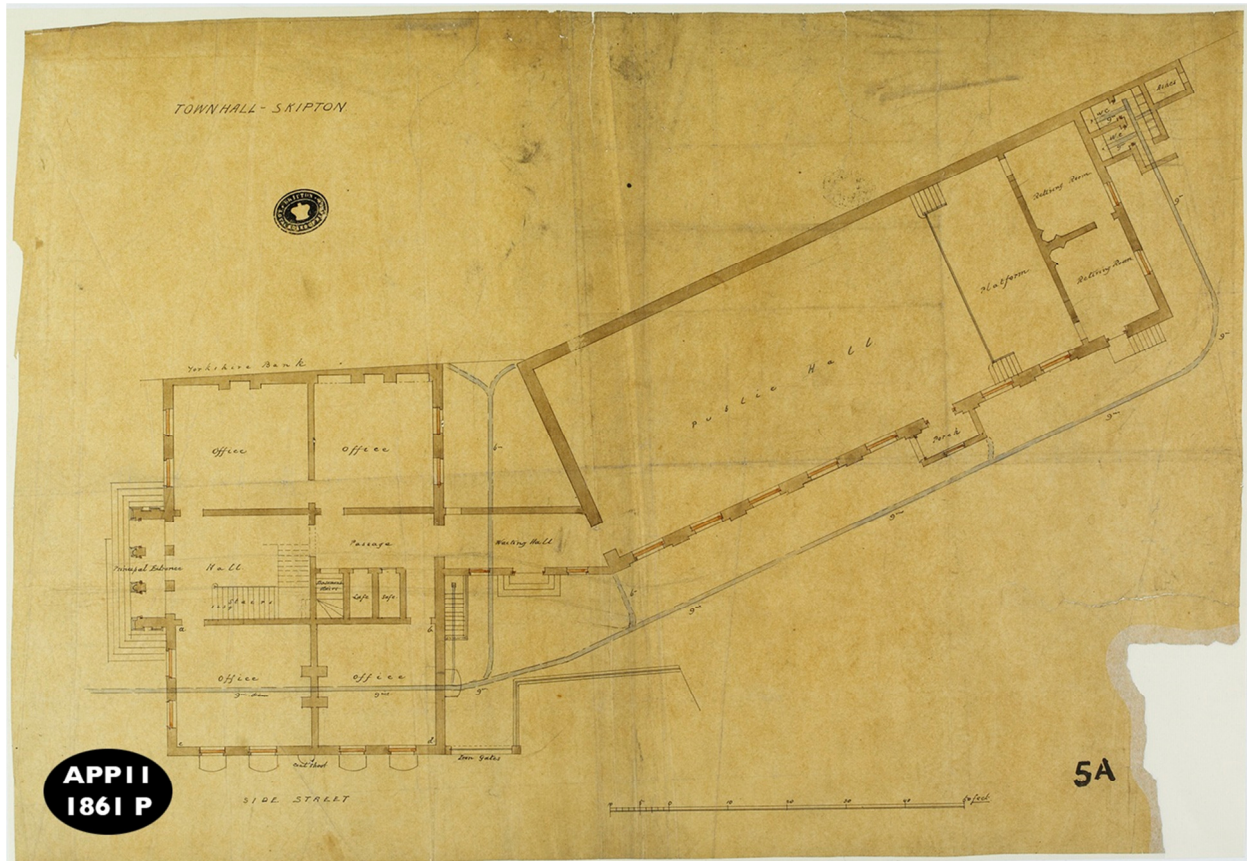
1861 plan of the Town Hall, see 3.4.3 above. Note fireplace positions, basement light wells on Jerry Croft, the south entrance, platform and rear yard with two privies where cisterns were installed in 1924.
